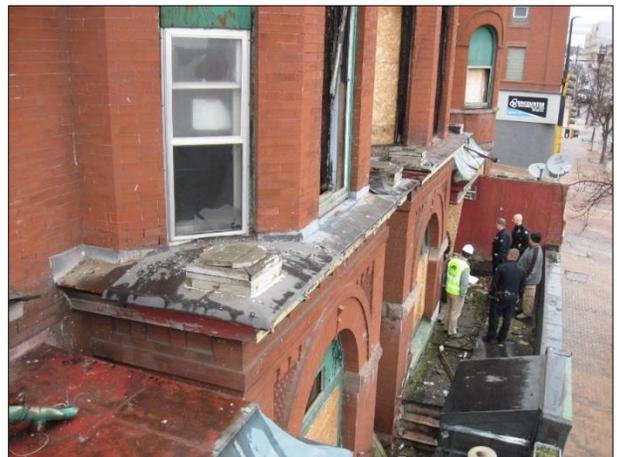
Street elevation close up showing metal capped façade features and EPDM membrane condition on Kozy extension below where Police are standing. Note various window conditions. No salvageable windows found.
